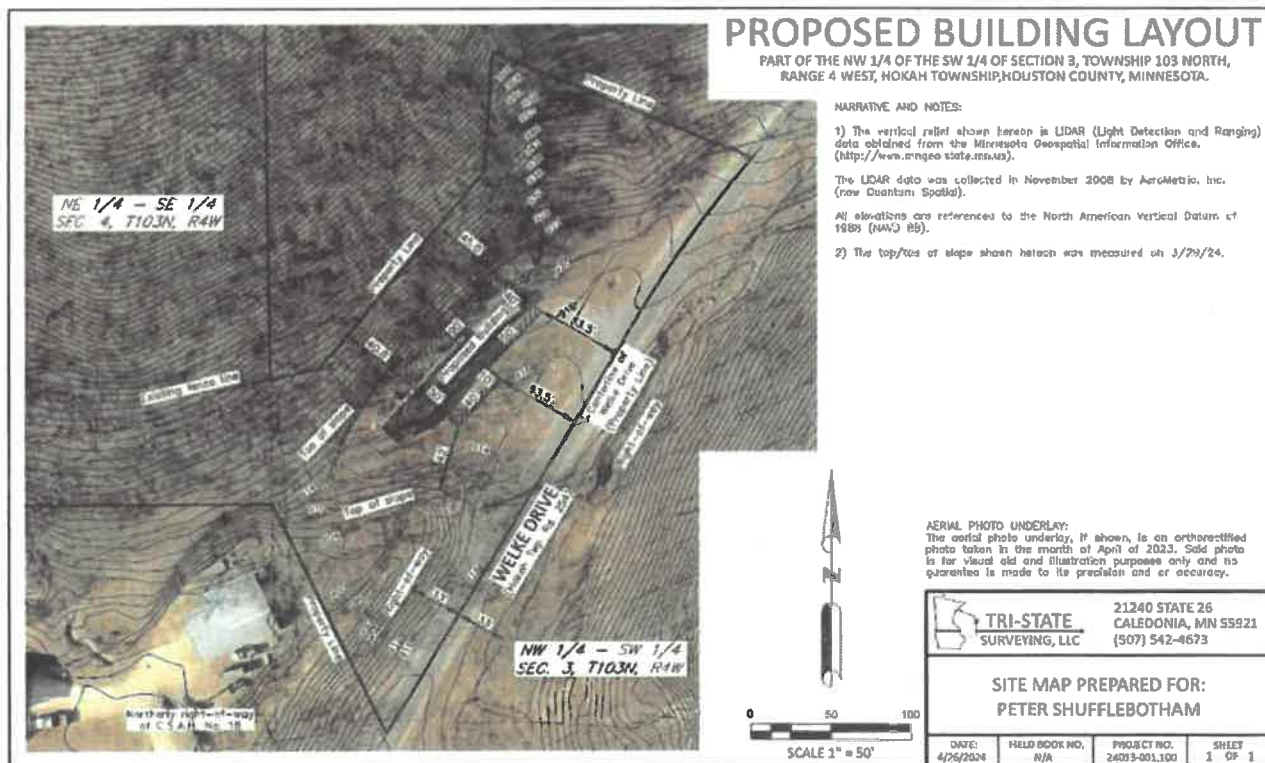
Setbacks for Proposed Dwelling (Revised Aerial View)
